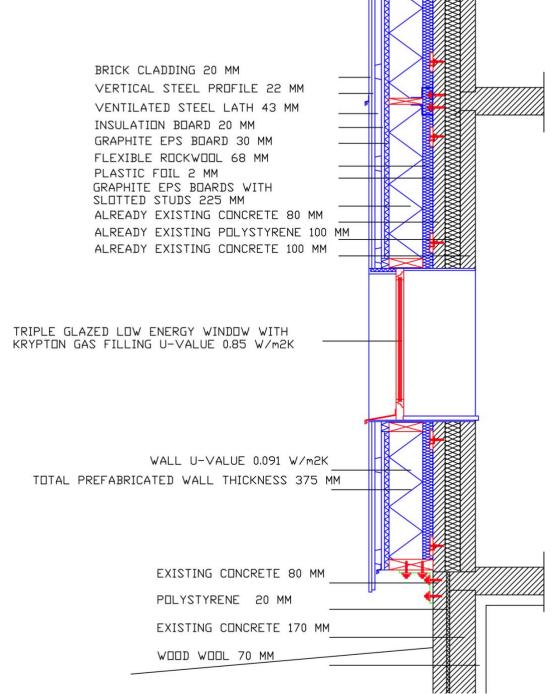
Detail drawing of the Alingsås prefabricated facade attached onto the existing building facade with the materials labelling and the U-value of the window and facade.
